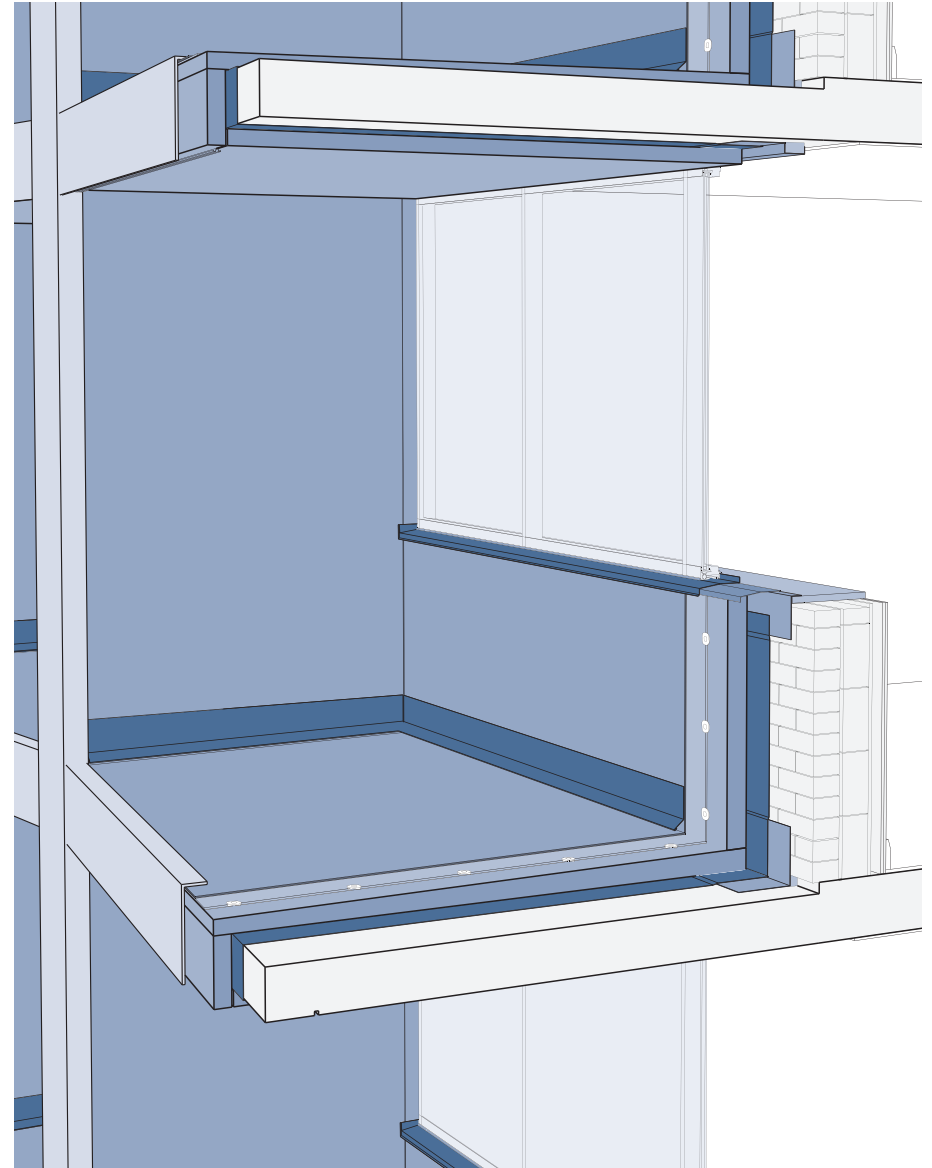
A drainage membrane is applied over the cement board surfaces. A dimpled plastic sheet material is commonly used for this purpose, and it adhered to the cement board with proper overlap between sheets and over the base flashing. A slab edge support for the guard is installed prior to the setting of the tile finish.
